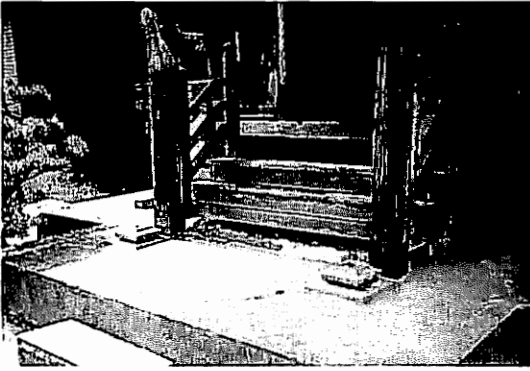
Kumano shrine, Kamitakada, Sasakami Village thrown by 30 cm west. The couple of the main pillars transferred without wooden powder streak on the surface of the stone foundations suggesting strong vertical acceleration than terrestrial gravity occurred.
